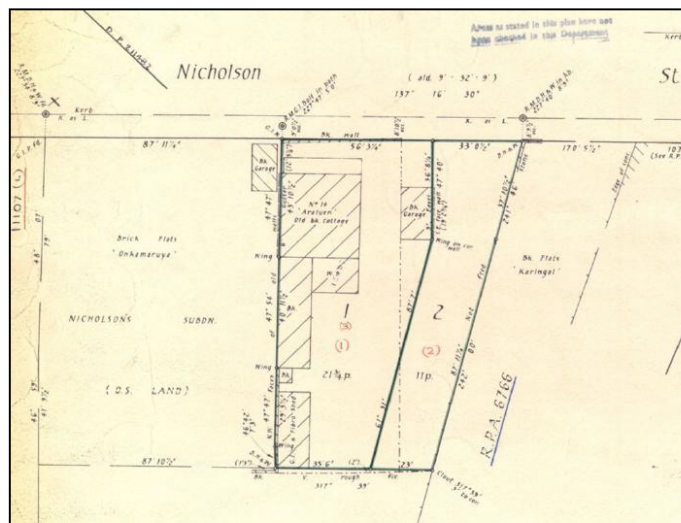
Detail, Deposited Plan showing boundary adjustment. Note the dwelling is referred in this plan by its original name 'Araluen'. NSW LPI, Deposited Plan No. 211482.
